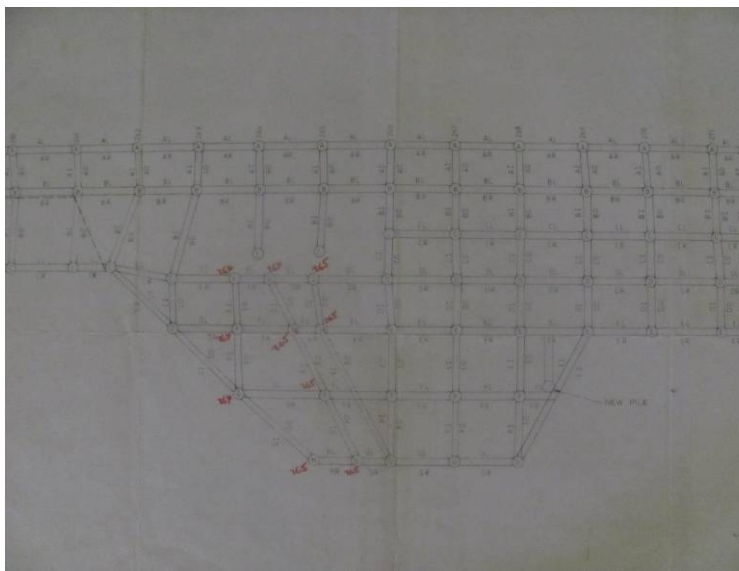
Extract from Public Works Department drawing 83-2001-W showing the portion of the original structure added after Figure 32 was taken.
